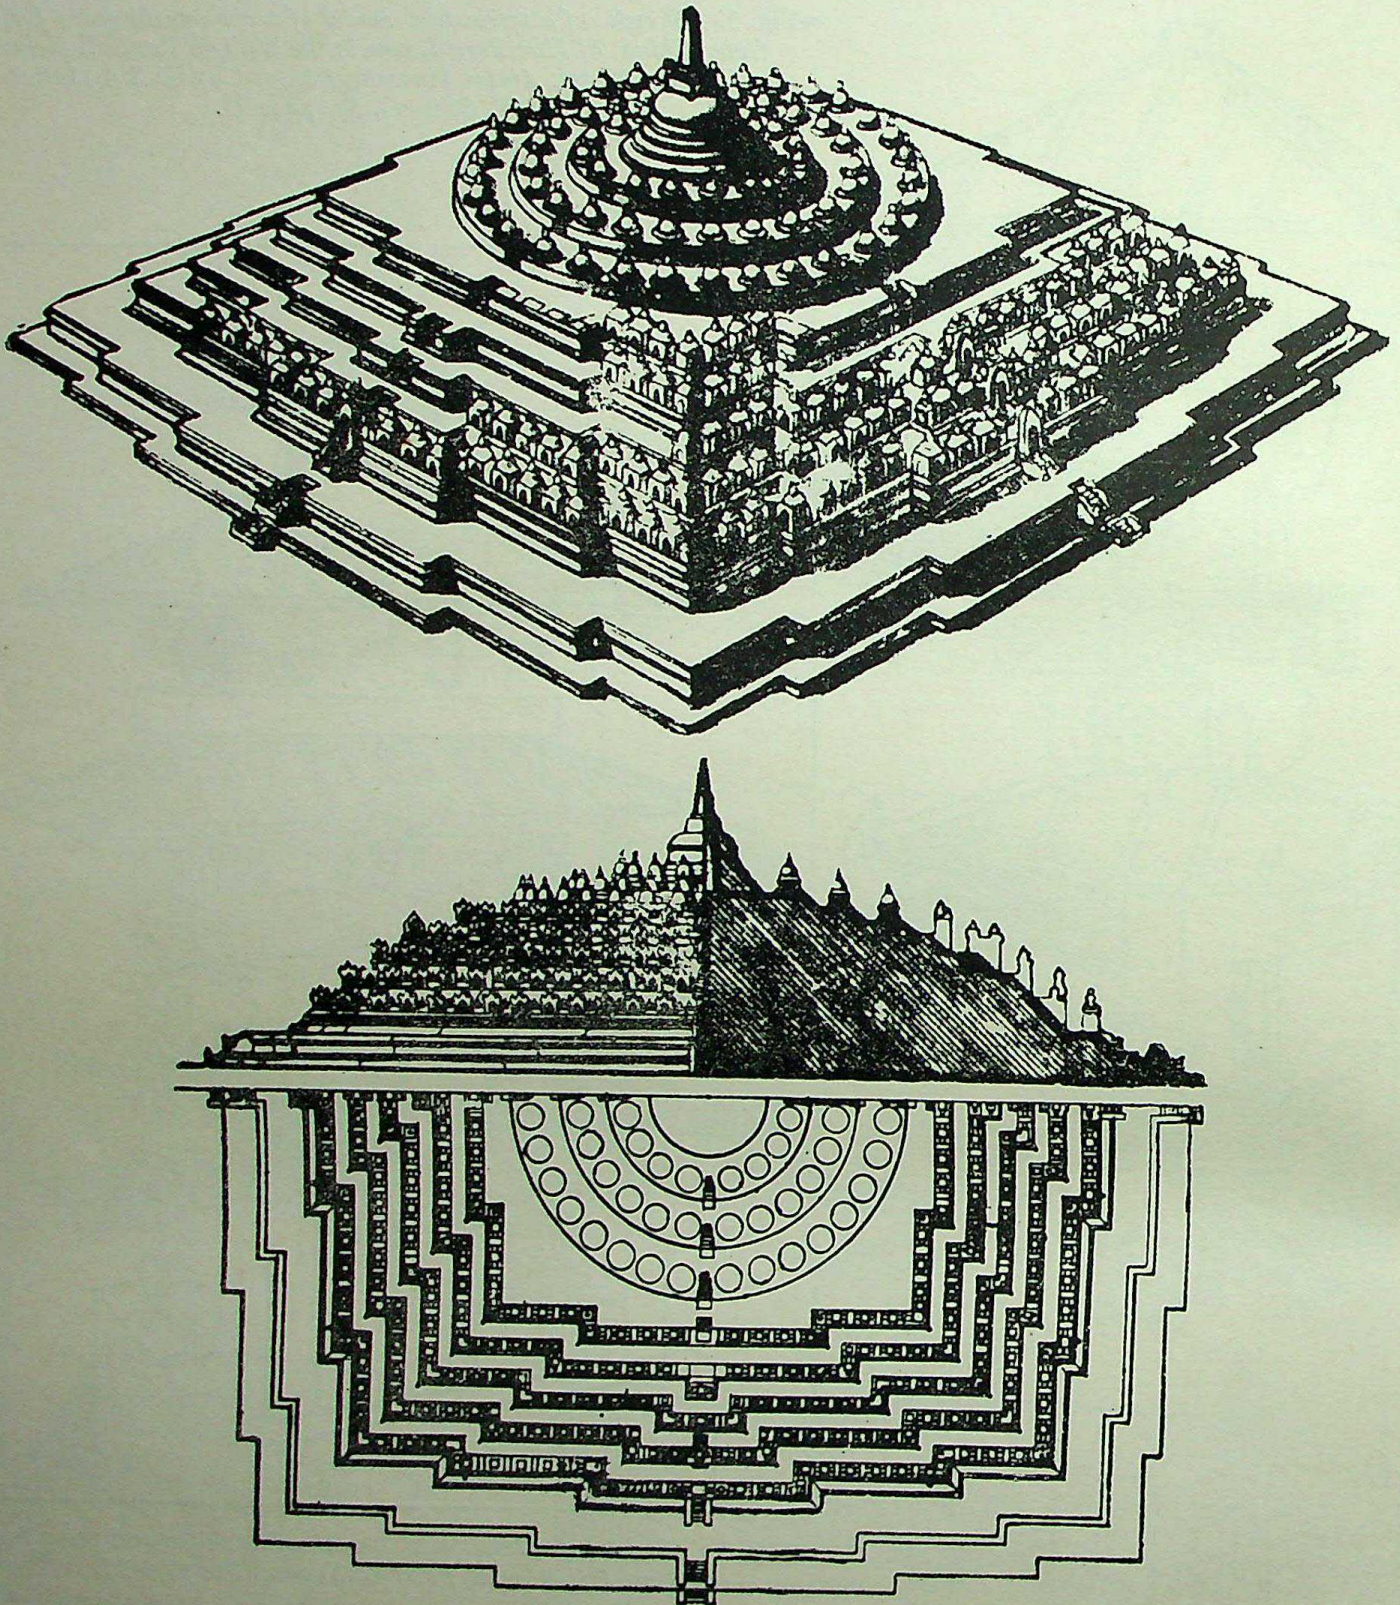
A & B. Elevation, section and and plan of the stūpa at Barabudur, Java. See pages 123.
